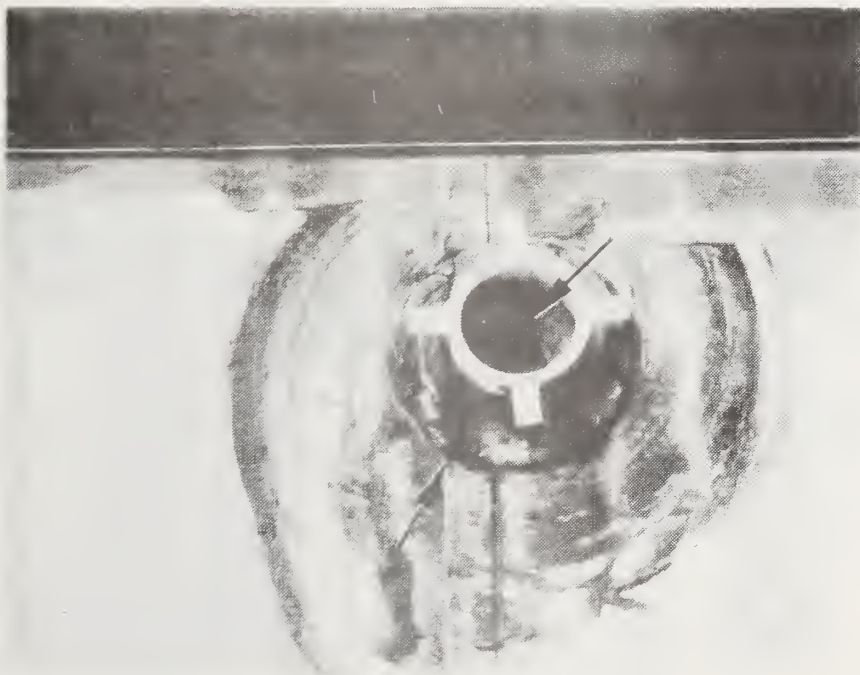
Rain Leak at Plumbing Vent Pipe Flashing Located at Joint of Metal Roofing. Also, Vent Pipe Does Not Penetrate Roof Covering
